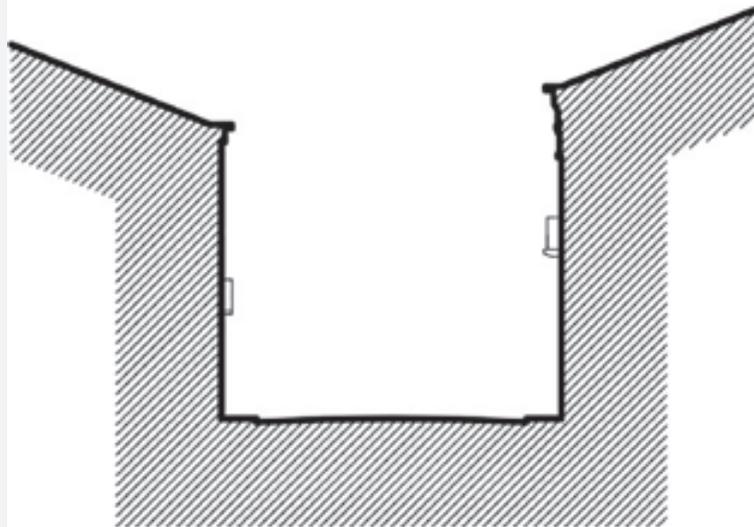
Street transversal cross-section: Rua do Raimundo. section at 1:500 scale
